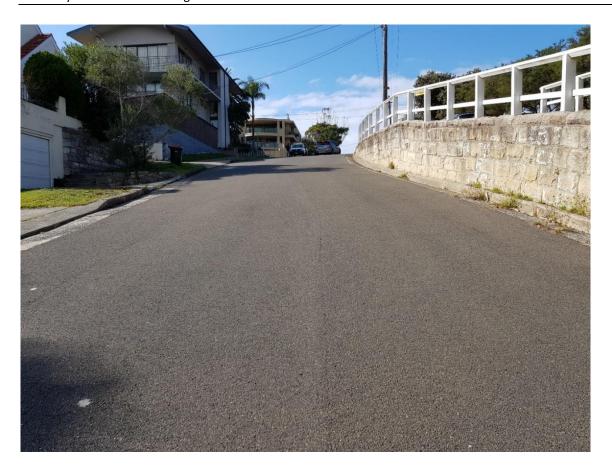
View of the intersection approach from Blake Street travelling east and the retaining wall obstructing the view of Victory Street.
